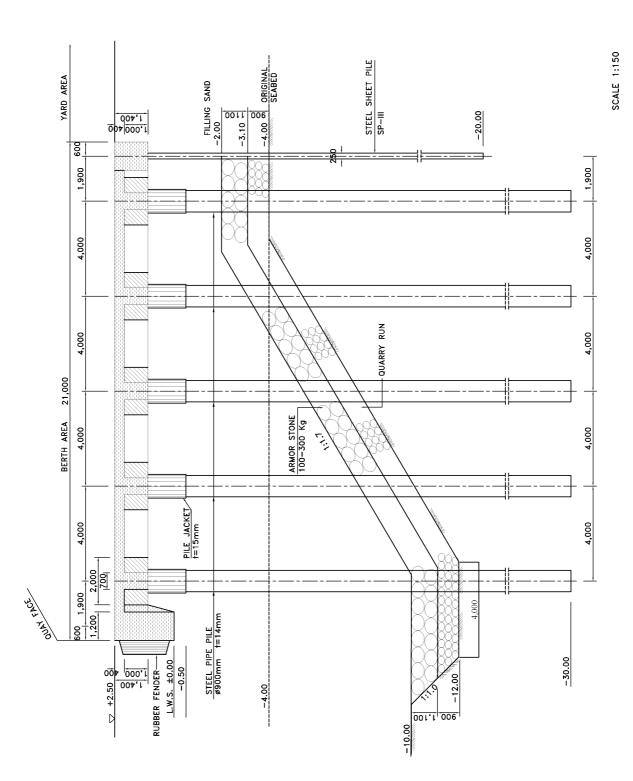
C-1 Typical Cross Section of Automobile Terminal Wharf (LWS-10 m)
